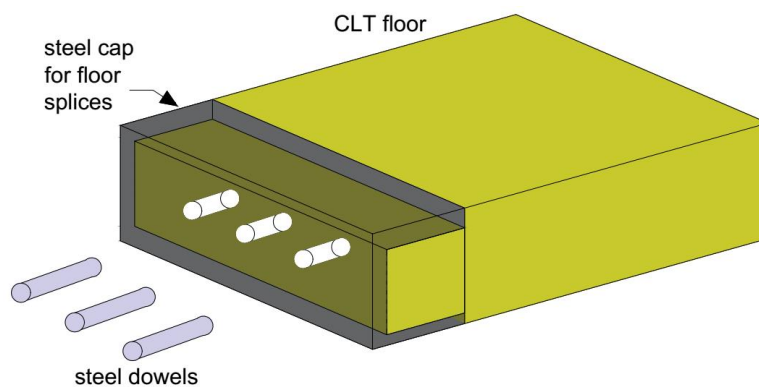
Connection detail of CLT floor as a coupling beam (Reproduced from Pei et al. 2017)
